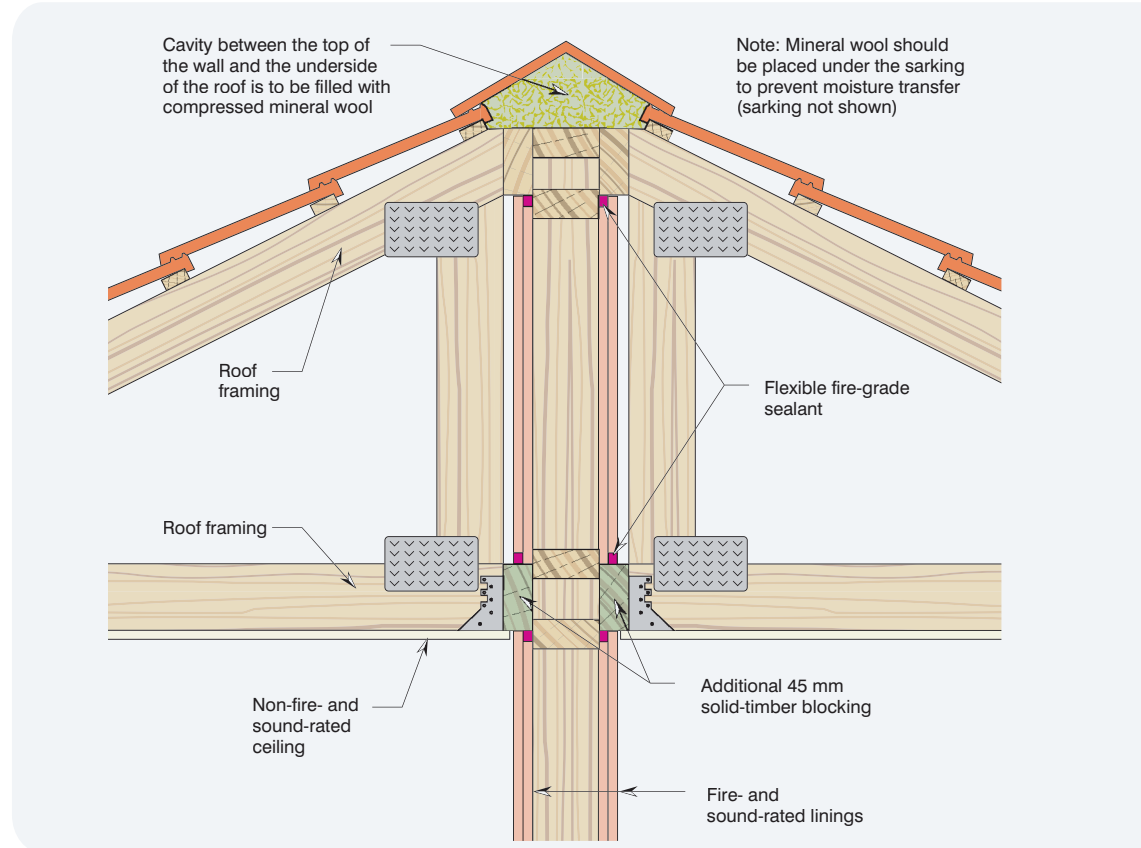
Timber blocks used to maintain fire-resistance – FRL 60 minutes in roof void – elevation view.
